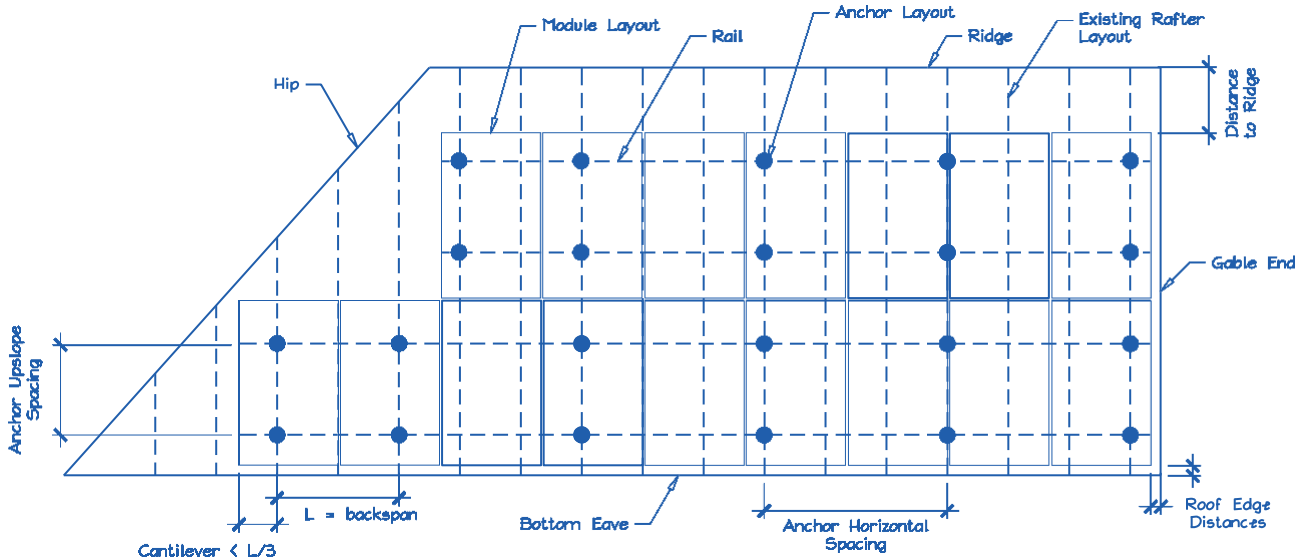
Roof Visual Structural Review (Contractor's Site Audit) of Existing Conditions.
